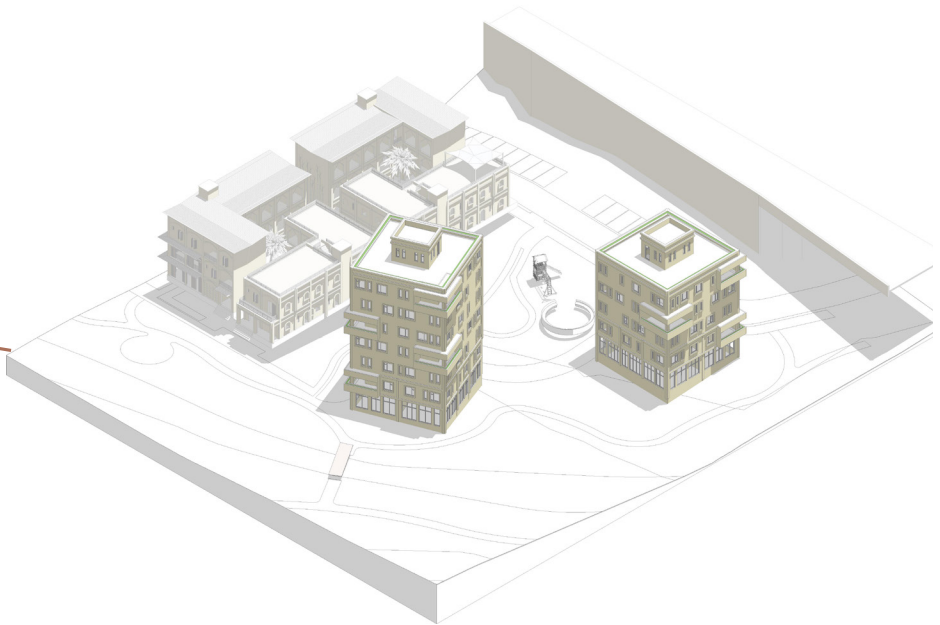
Architectural Definition of the “Dwelling Tower”
